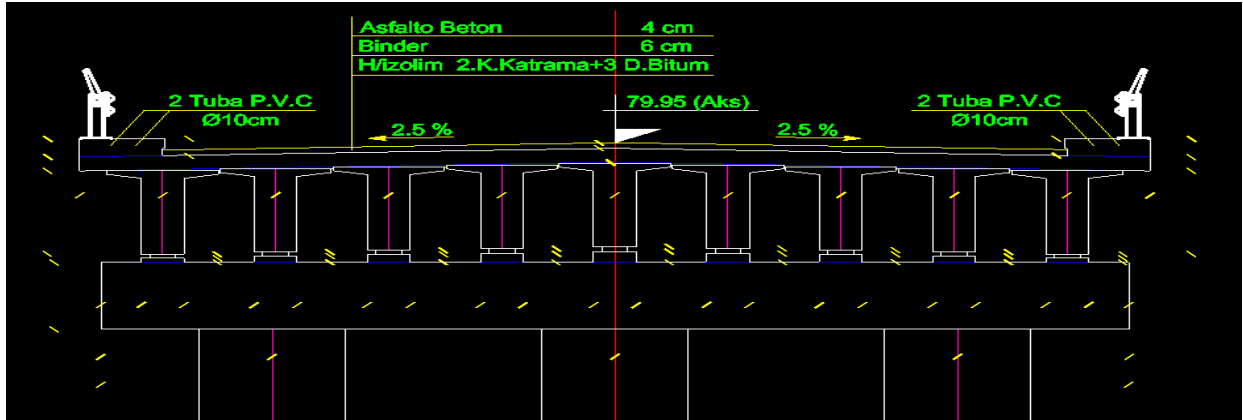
New bridge over the Erzeni River at km 3+233.97 – cross section.
